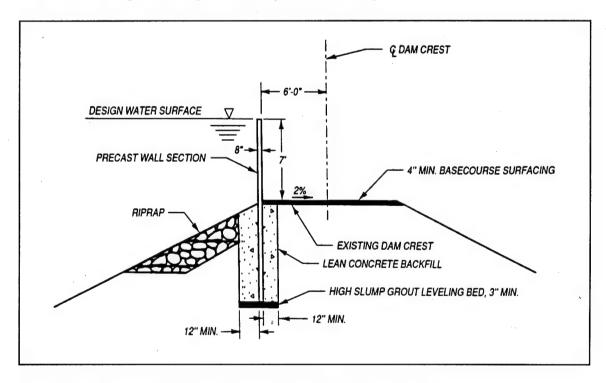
Cross section of crest, McClure Dam (after Kraai 1989)
